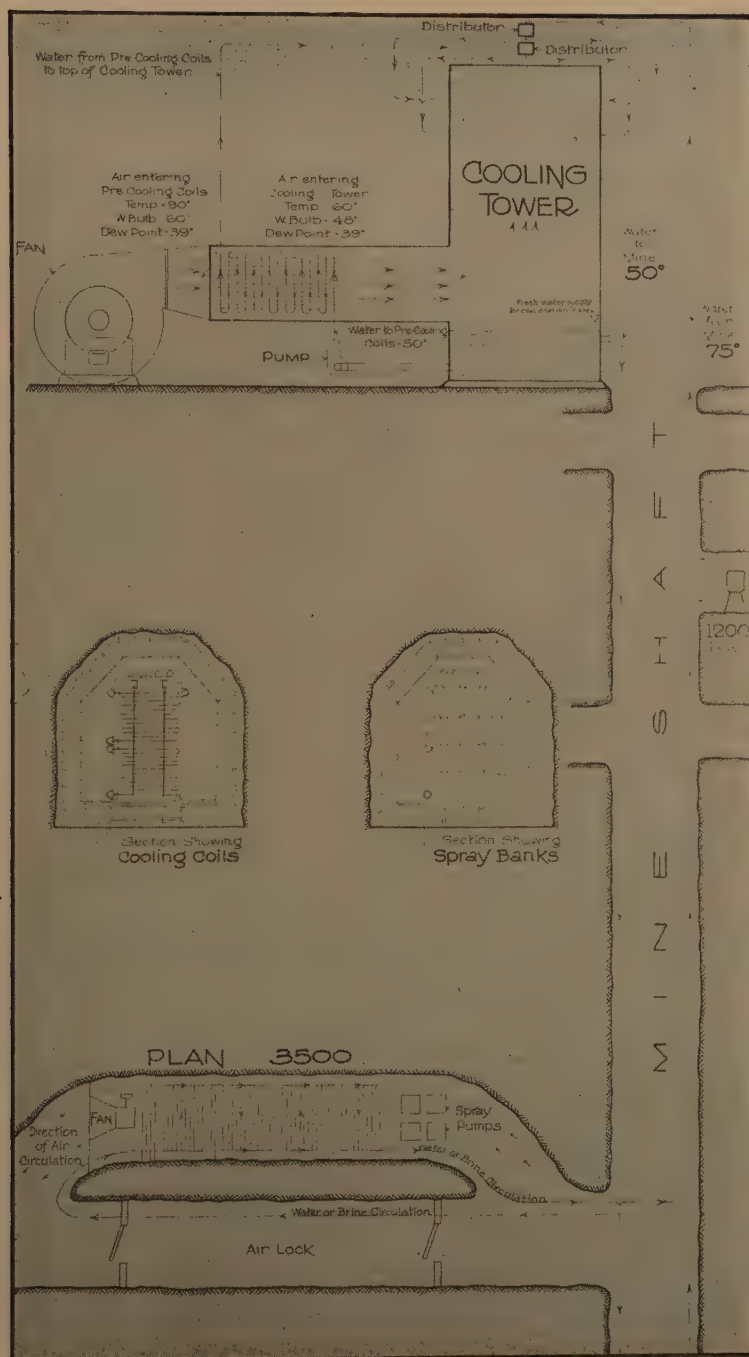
GENERAL PLAN OF AIR-CONDITIONING PLANT.
